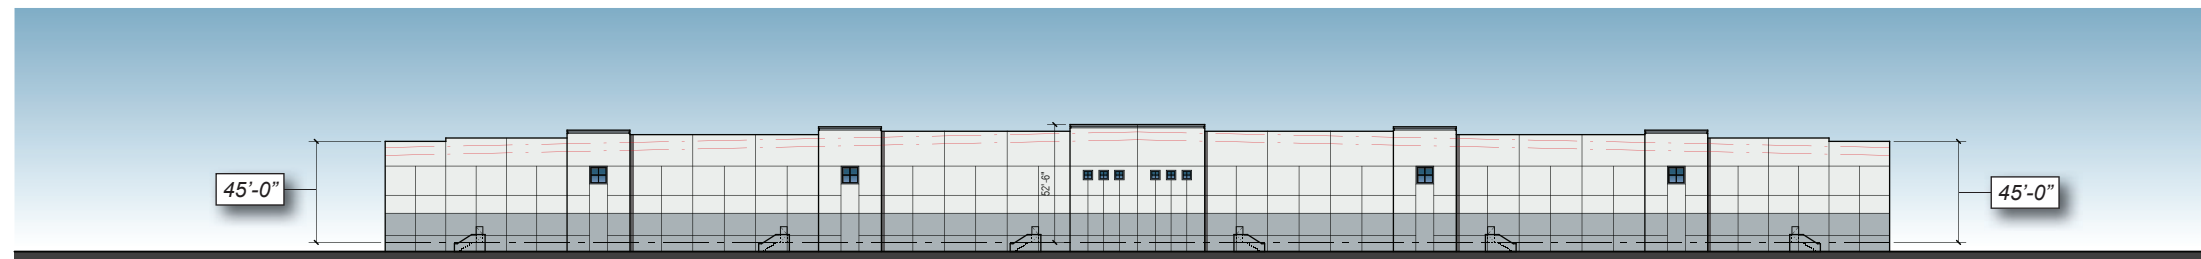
Pacific Oaks Commerce Center - Building 2 Elevations
